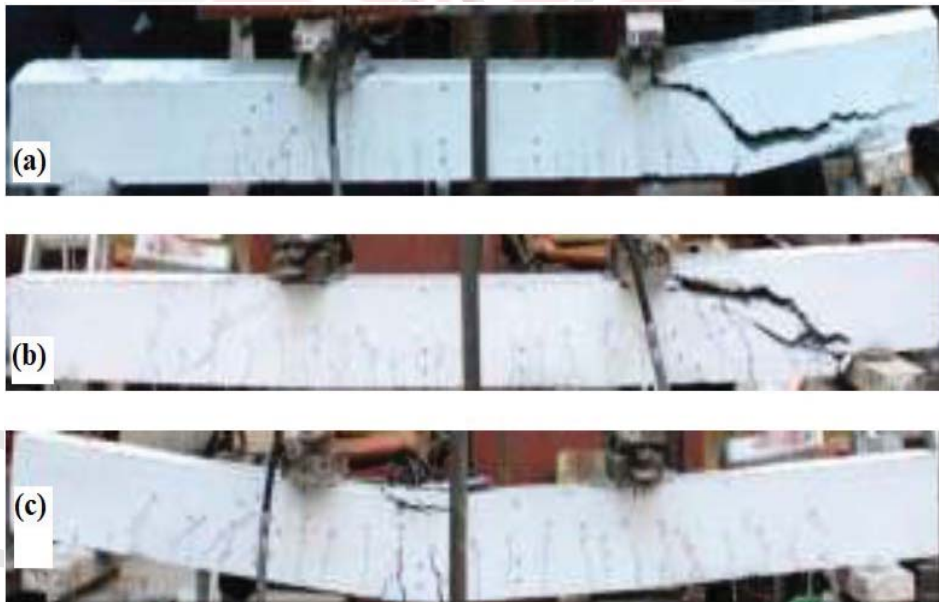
(a) Shear failure in a reinforced concrete beam containing no shear reinforcement; (b) shear failure in a reinforced concrete beam with improper shear detailing; and (c) typical flexural failure. Note the large residual deflection sustained by the beam shown at the bottom (Suryanto et al., 2016)
